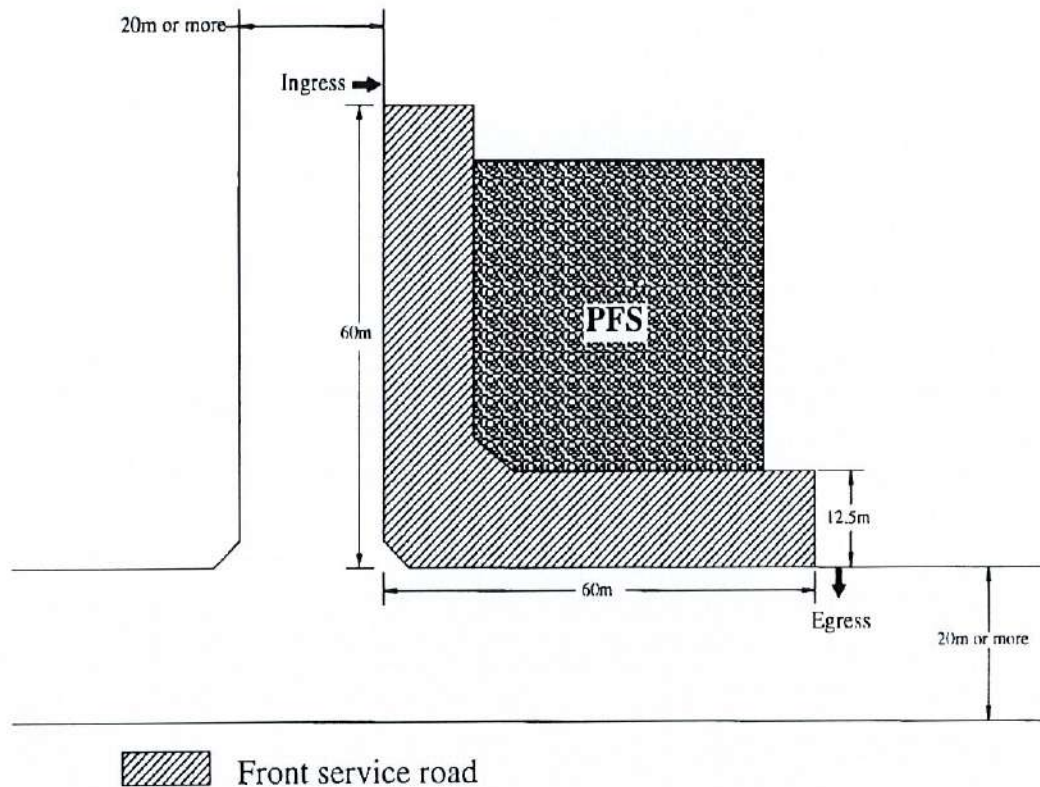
SITING OF PETROL FILLING STATION AT ROAD JUNCTION
